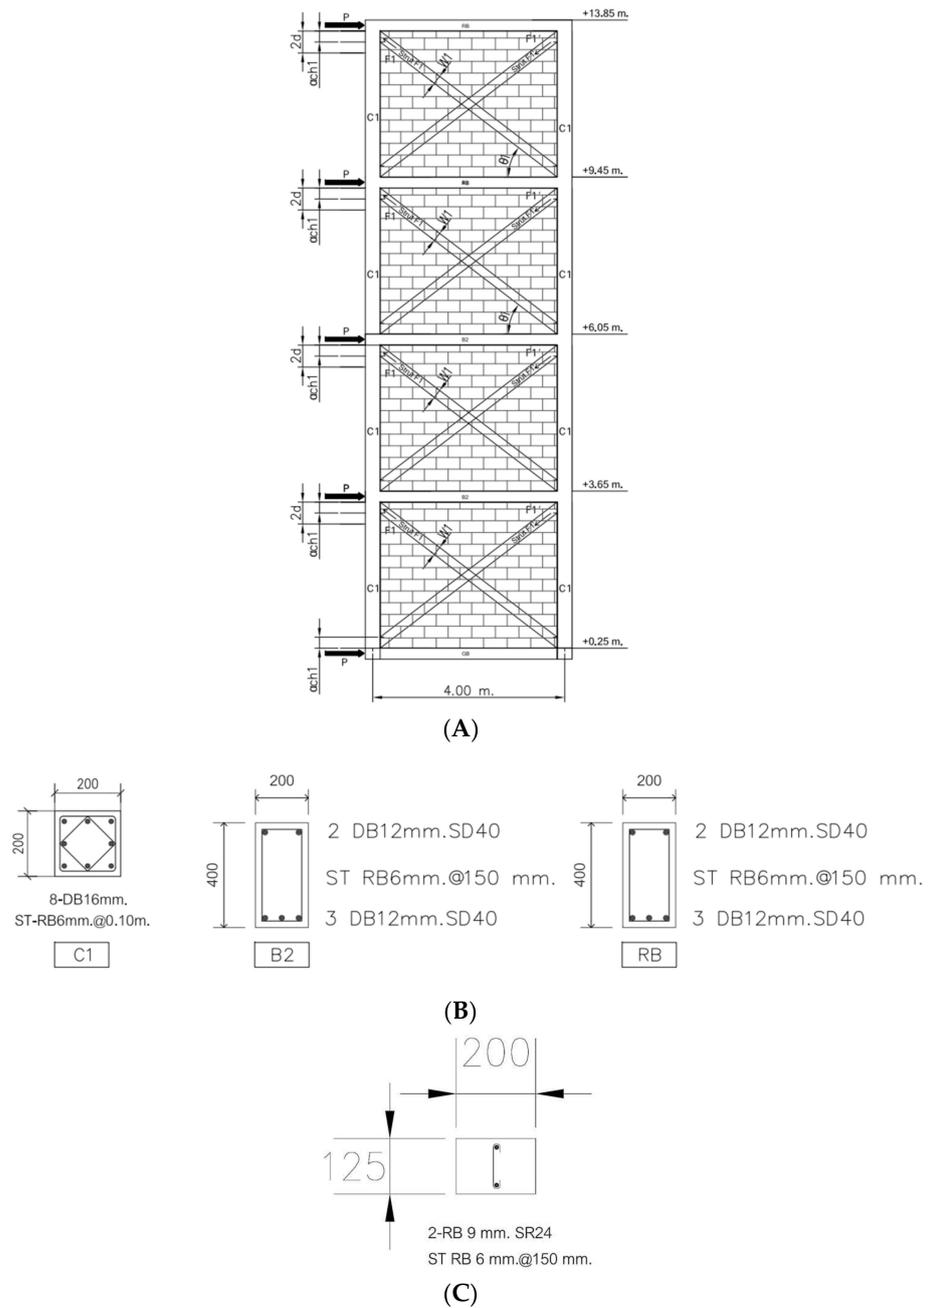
Masonry walls, columns, and beams reinforced with x-bracing concrete frame. (A) Single-span reinforced building frame; (B) cross-section of the reinforced column and beam; (C) cross-section of the reinforced x-bracing concrete frame.
